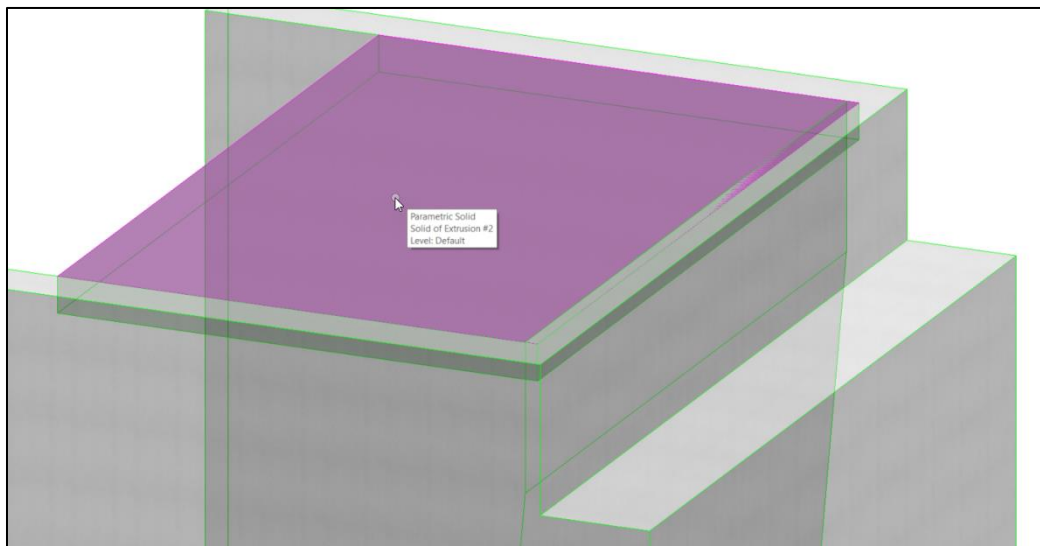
Abutment Backwall and Approach Slab Occupying the Same Volume
